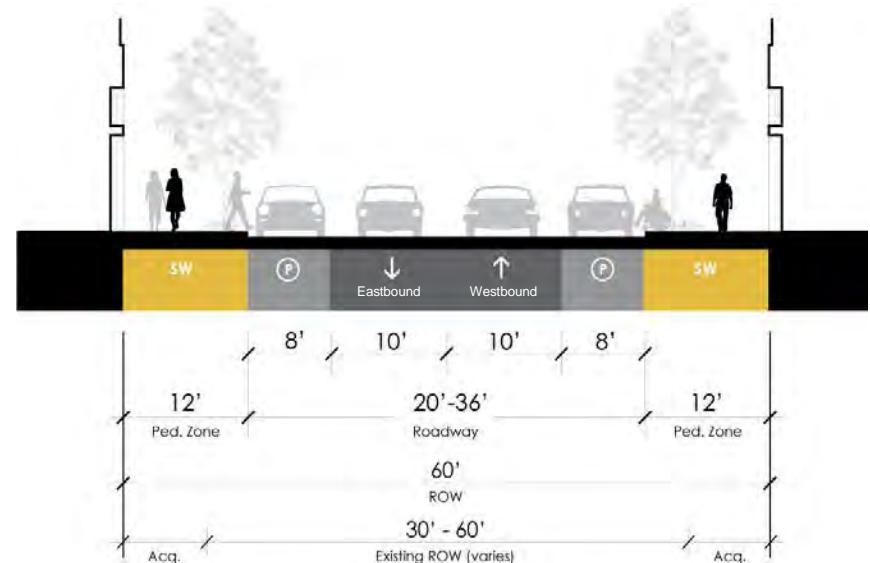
Retail Street Illustration (18th Street View Looking West to Main Street)
